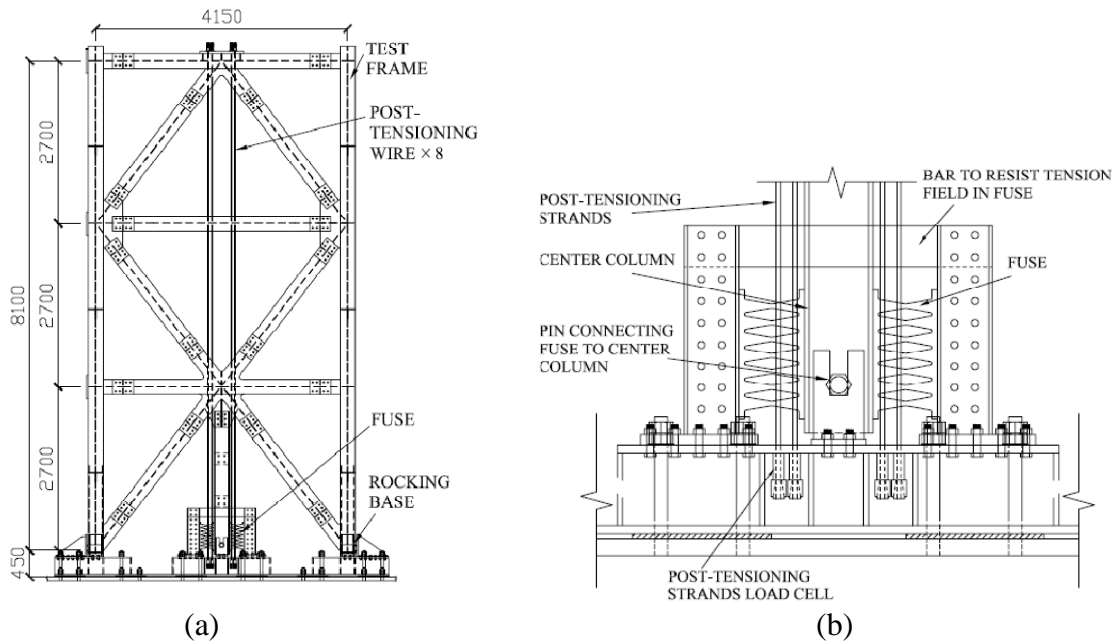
Specimen drawing: (a) braced frame and (b) fuse assembly.
